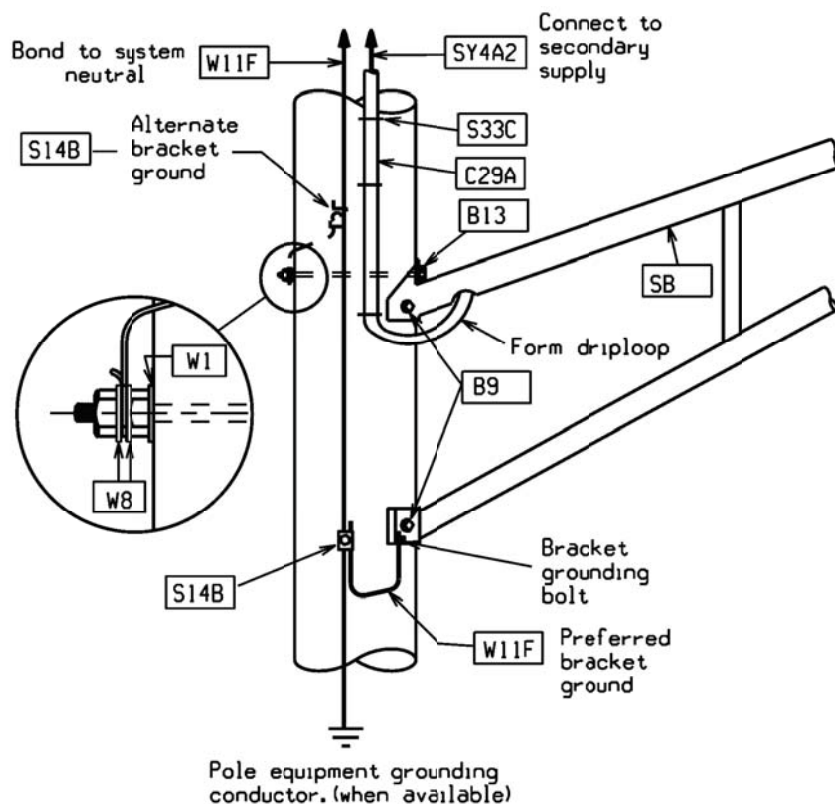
Street Light Installation Using Tapered Truss Bracket
